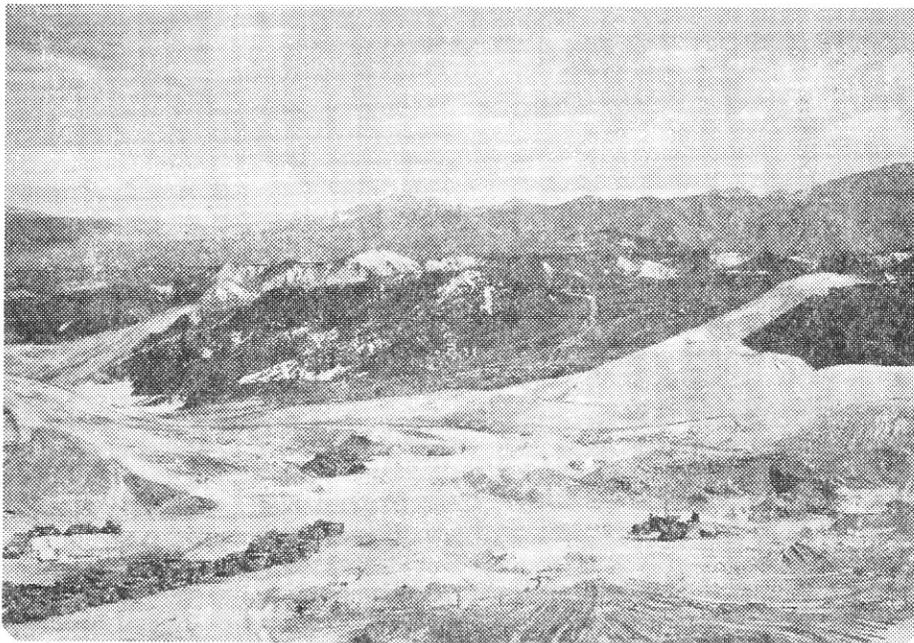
Looking northeasterly at typical scale of earthworks on Route 14.
